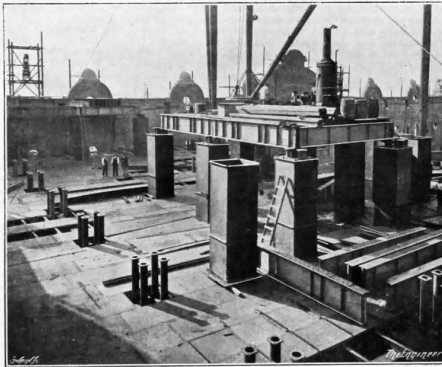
CABALLITO RESERVOIR—SECOND FLOOR PLATING
